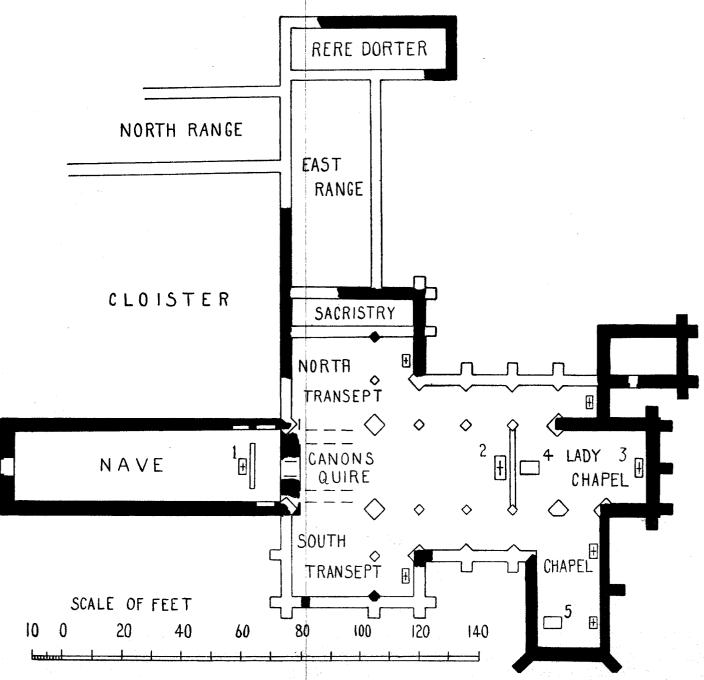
WHITHORN: RESTORED PLAN OF PRIORY CHURCH.
